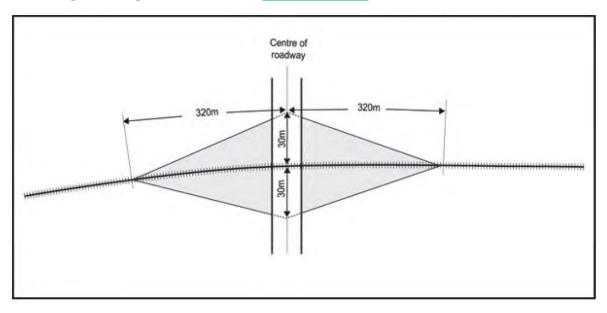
Approach sight triangles for public <u>road/rail level crossings</u>
